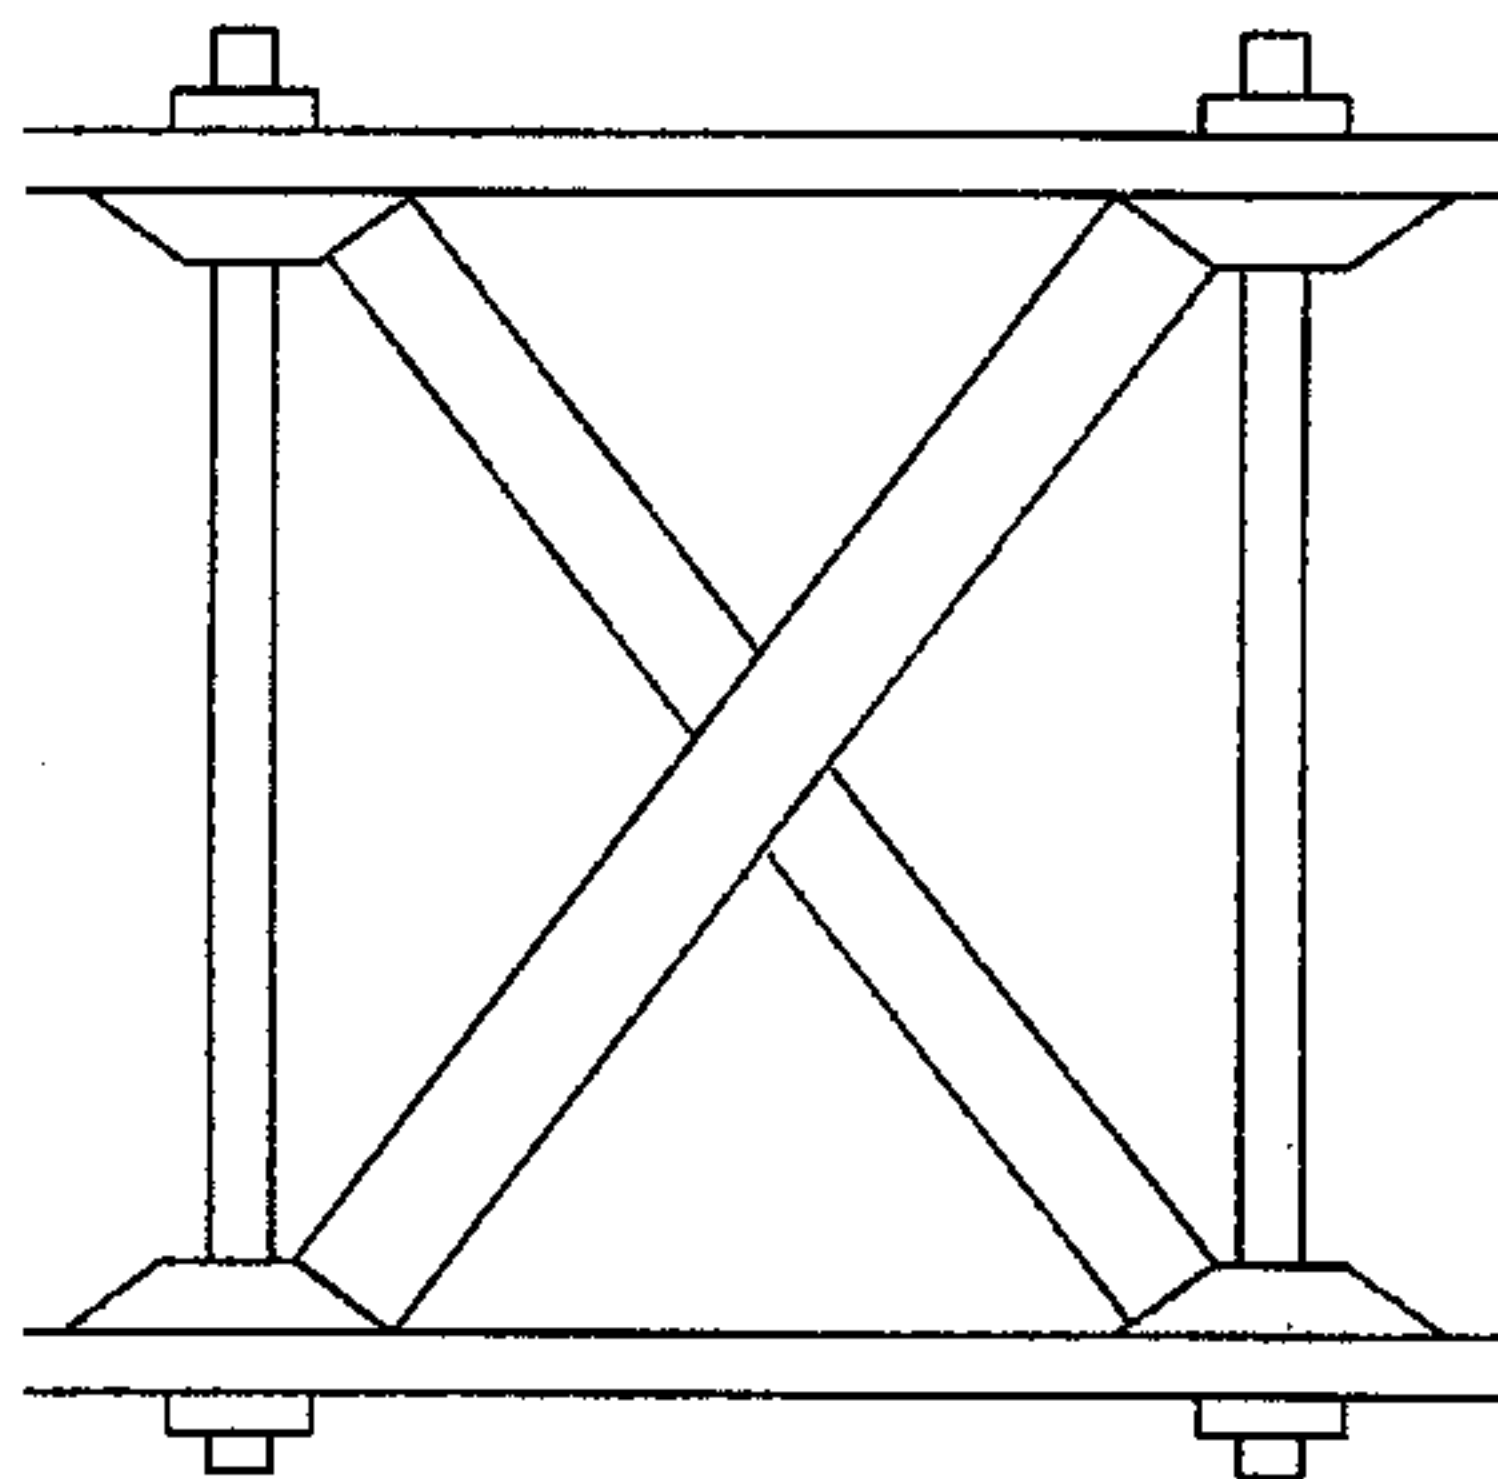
The Fremont Mill Bridge's top chord is a Howe truss formed from gas pipe and boiler plate.
